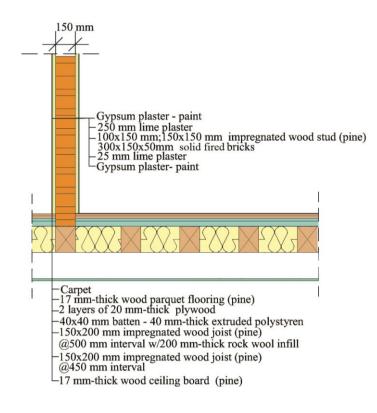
Sections of Reconstructed-Wall 1 & Reconstructed-Floor 1 in 1/20 scale (Drawn by author).
